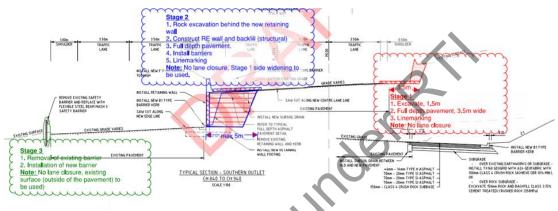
Typical section - Southern Outlet Ch. 840 to Ch. 940
